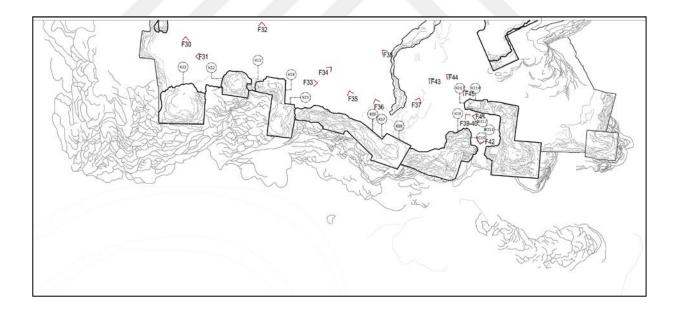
North Side Interior Walls Photos Aspects and Wall Encodings
